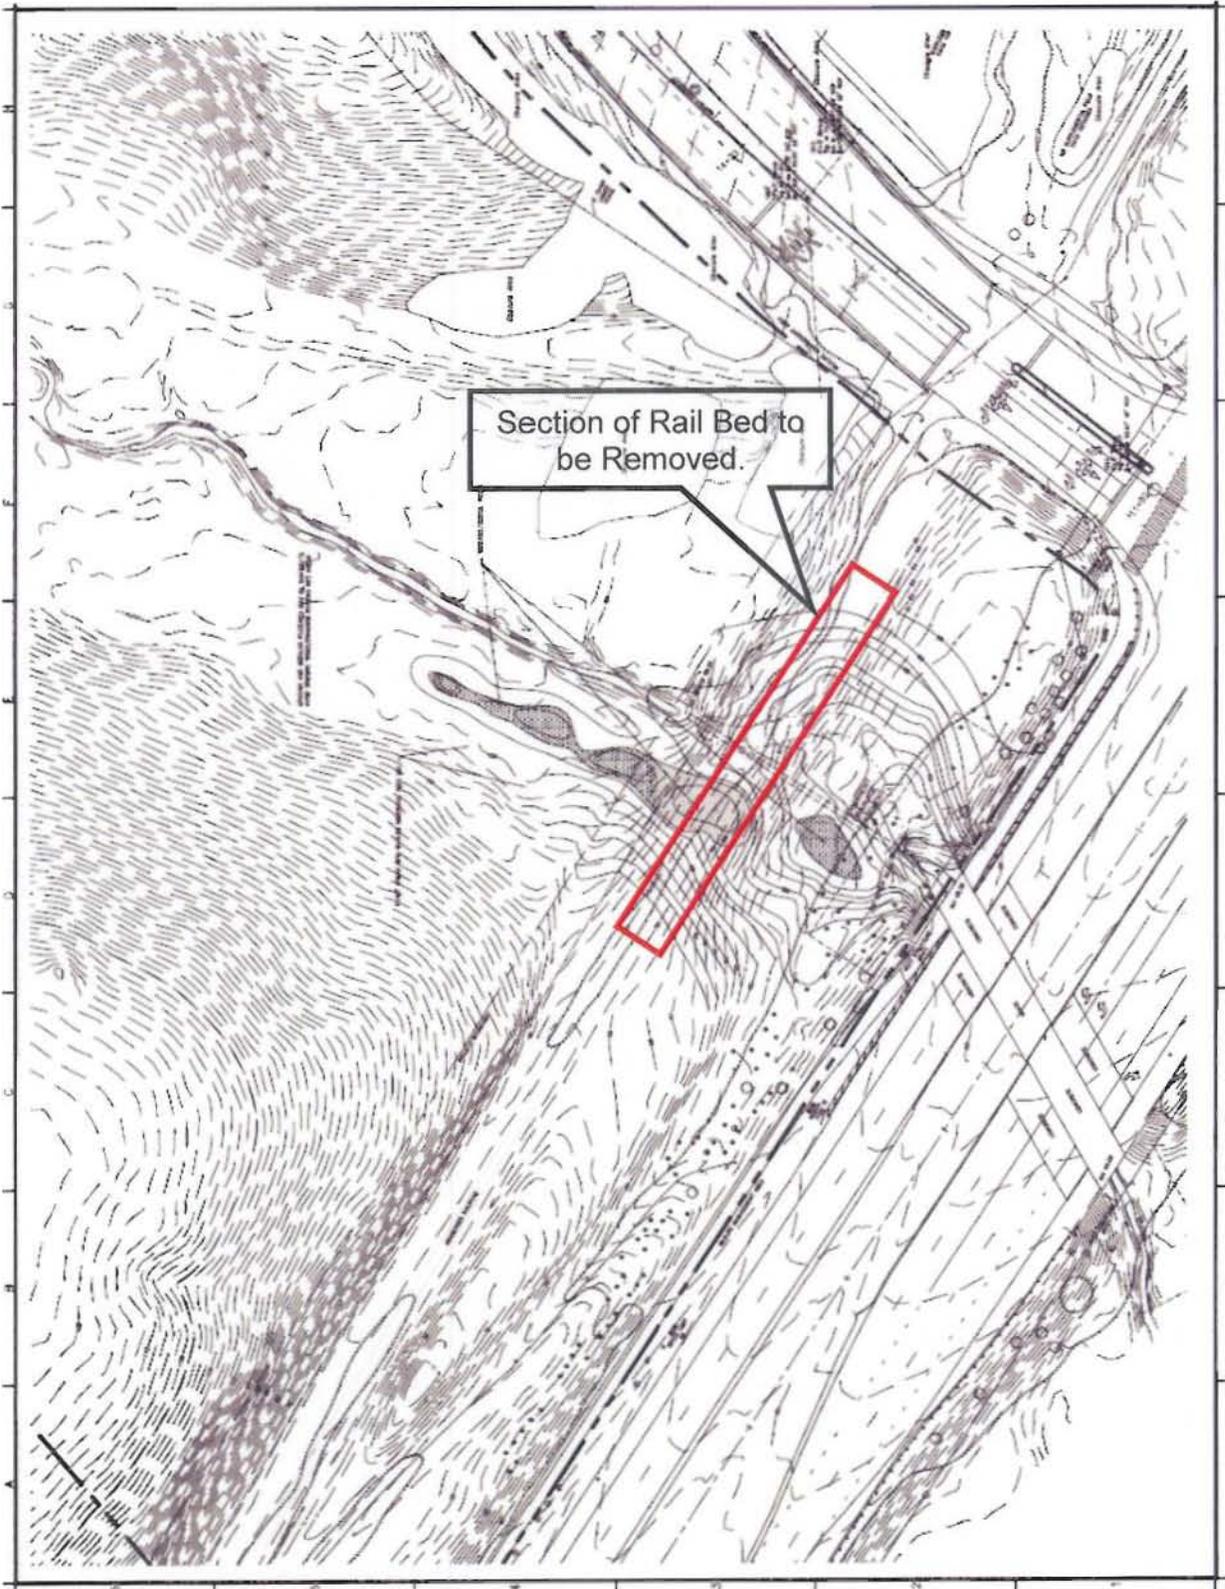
; Rail Bed Removal for Failed Culvert Demolition
